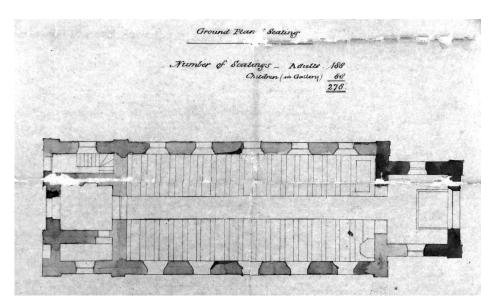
Seating plan and ground floor layout of the Red Church (Shropshire Archives (7))
